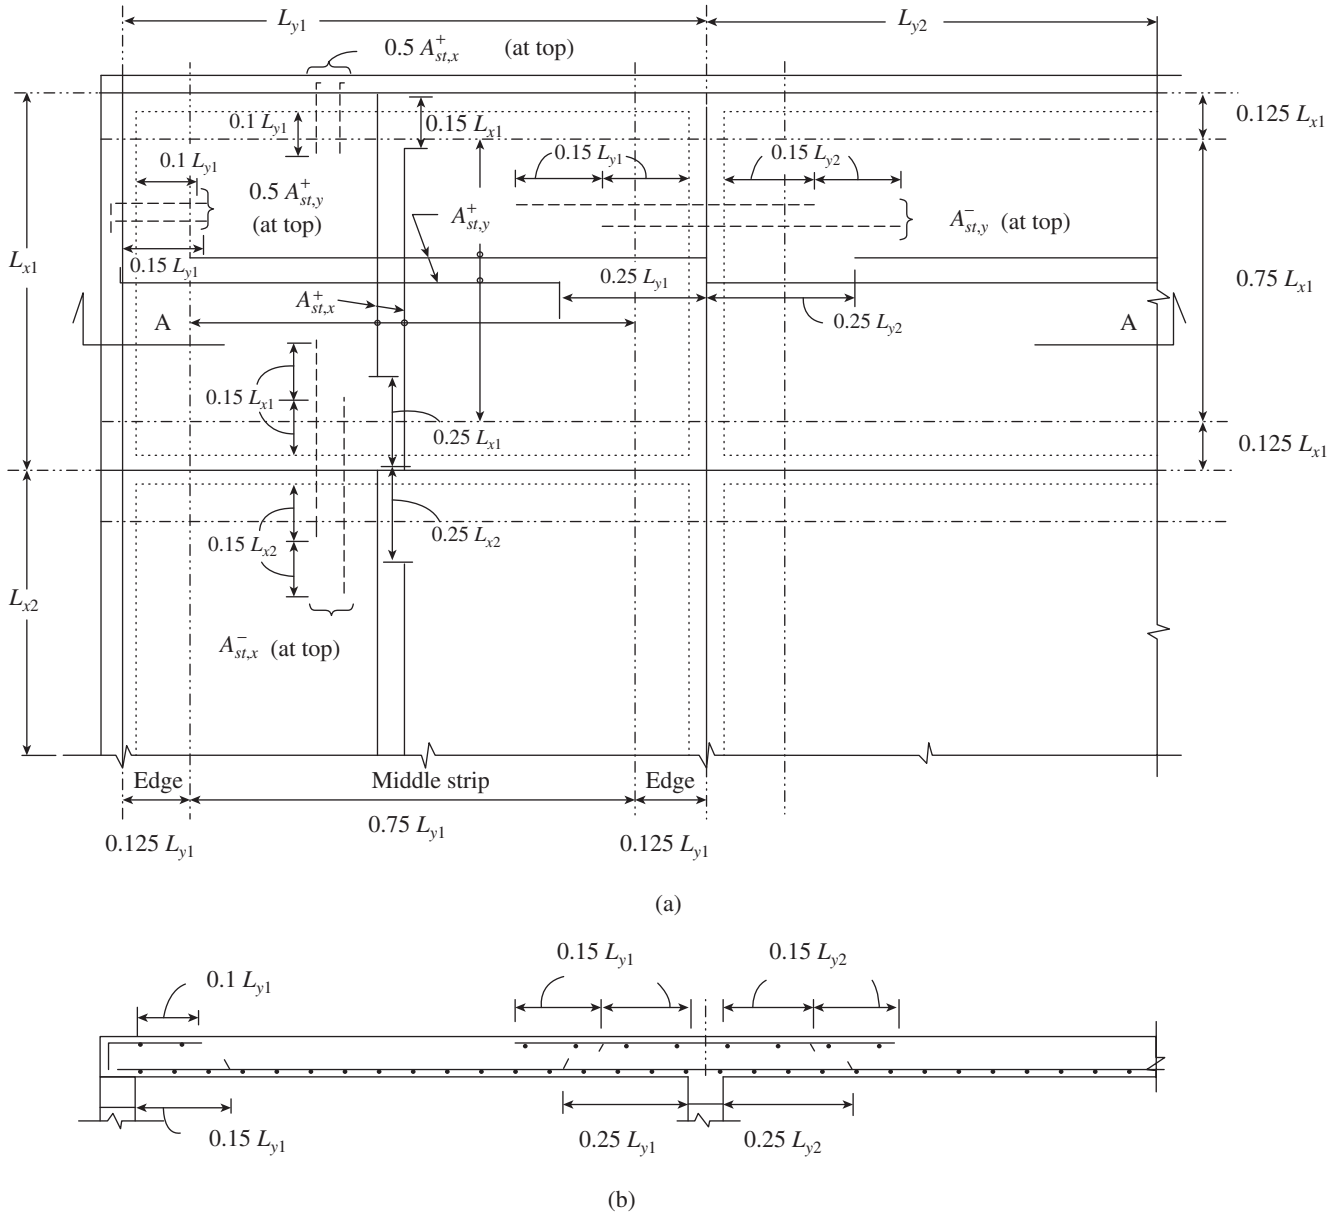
Reinforcement detailing in restrained two-way slabs (a) Plan (b) Section 'AA'
